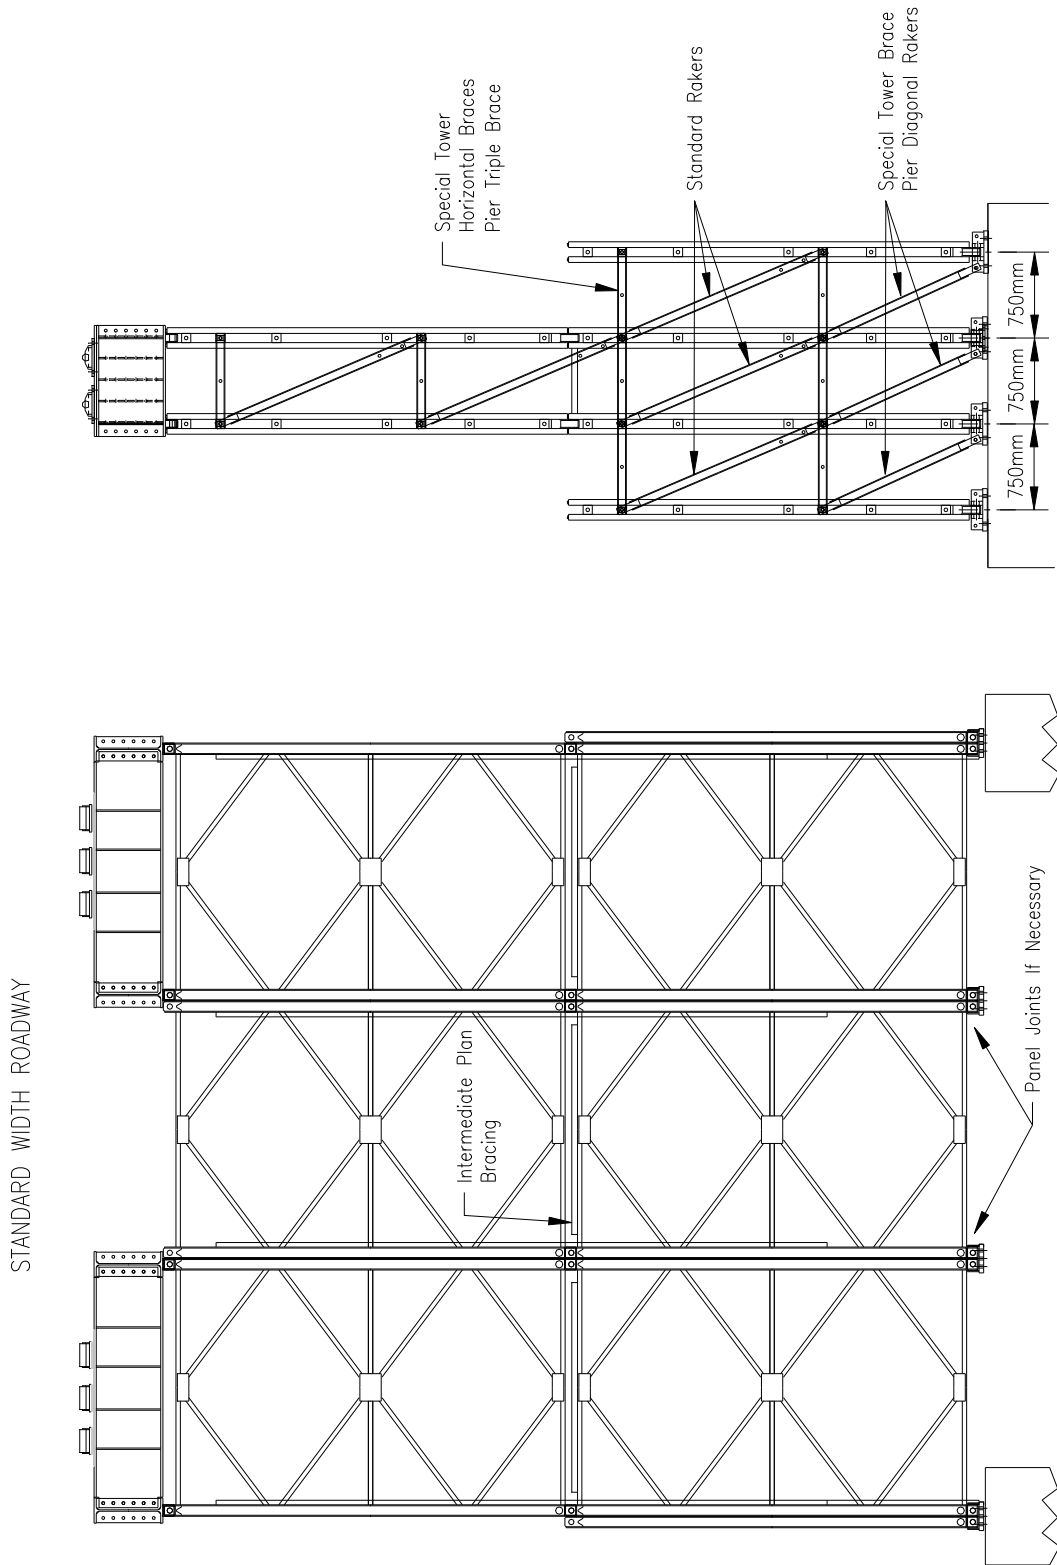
TYPICAL PIER WITH OUTRIGGER PANELS
